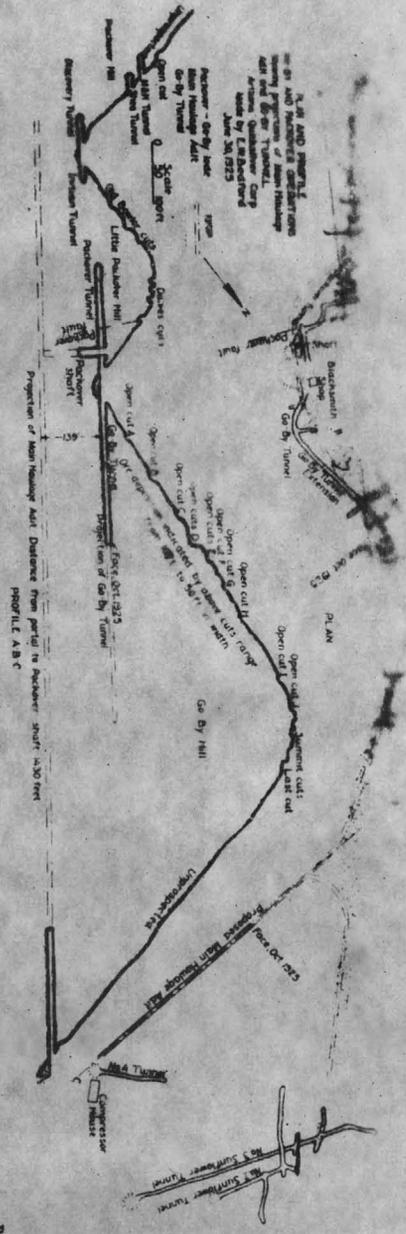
Section of hill and plan of haulage tunnel, Sunflower group.
